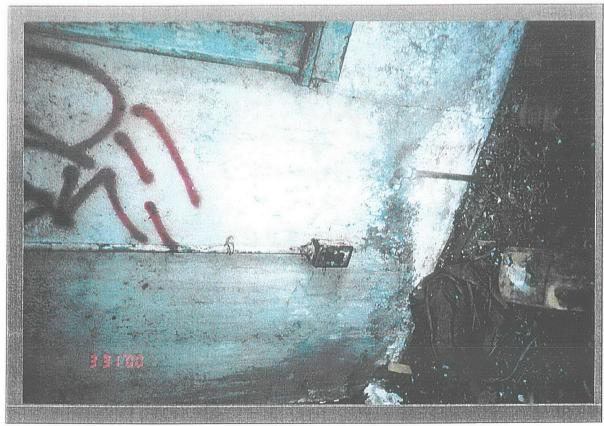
Facing east. Monitoring well MW-36 in center and manhole MH-3 to left.
